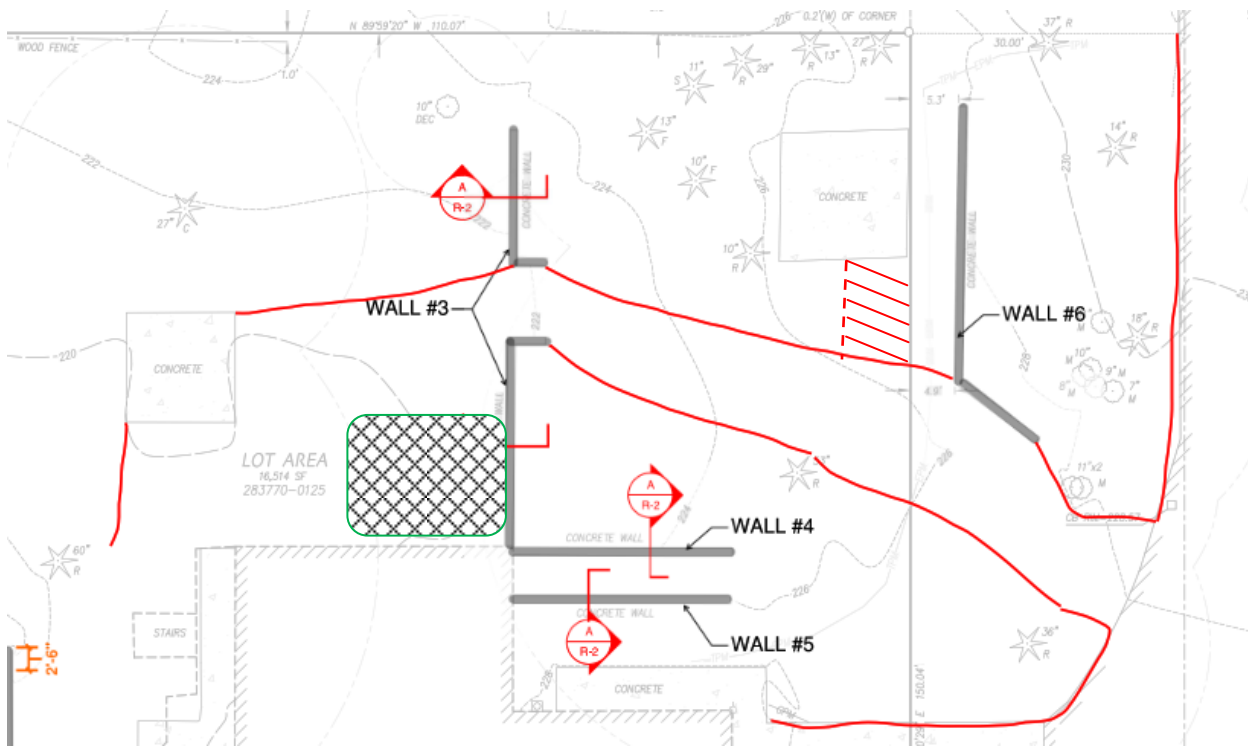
Rough outline of the where the tree protection fencing should be installed. The red striped area is where safe entrance to the concrete pad can be made. The cross-hatched area is good space for stockpiling.
